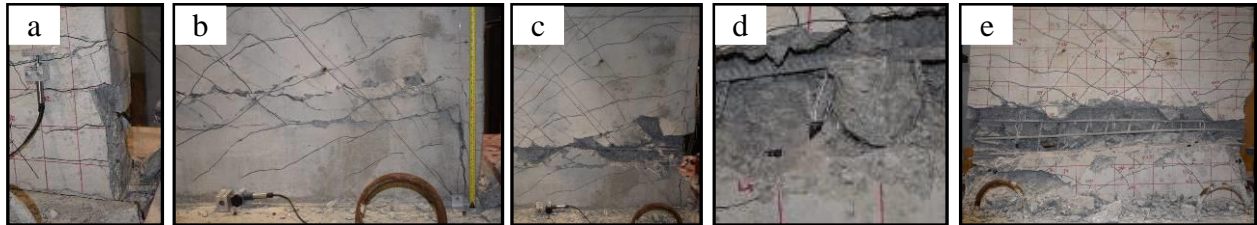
Failure progression of specimen SX4: (a) spalling of concrete cover; (b) concrete deterioration above sliding reinforcement; (c) spalling of the deteriorated concrete (d) buckling of longitudinal reinforcement causing failure; (e) specimen face at failure
